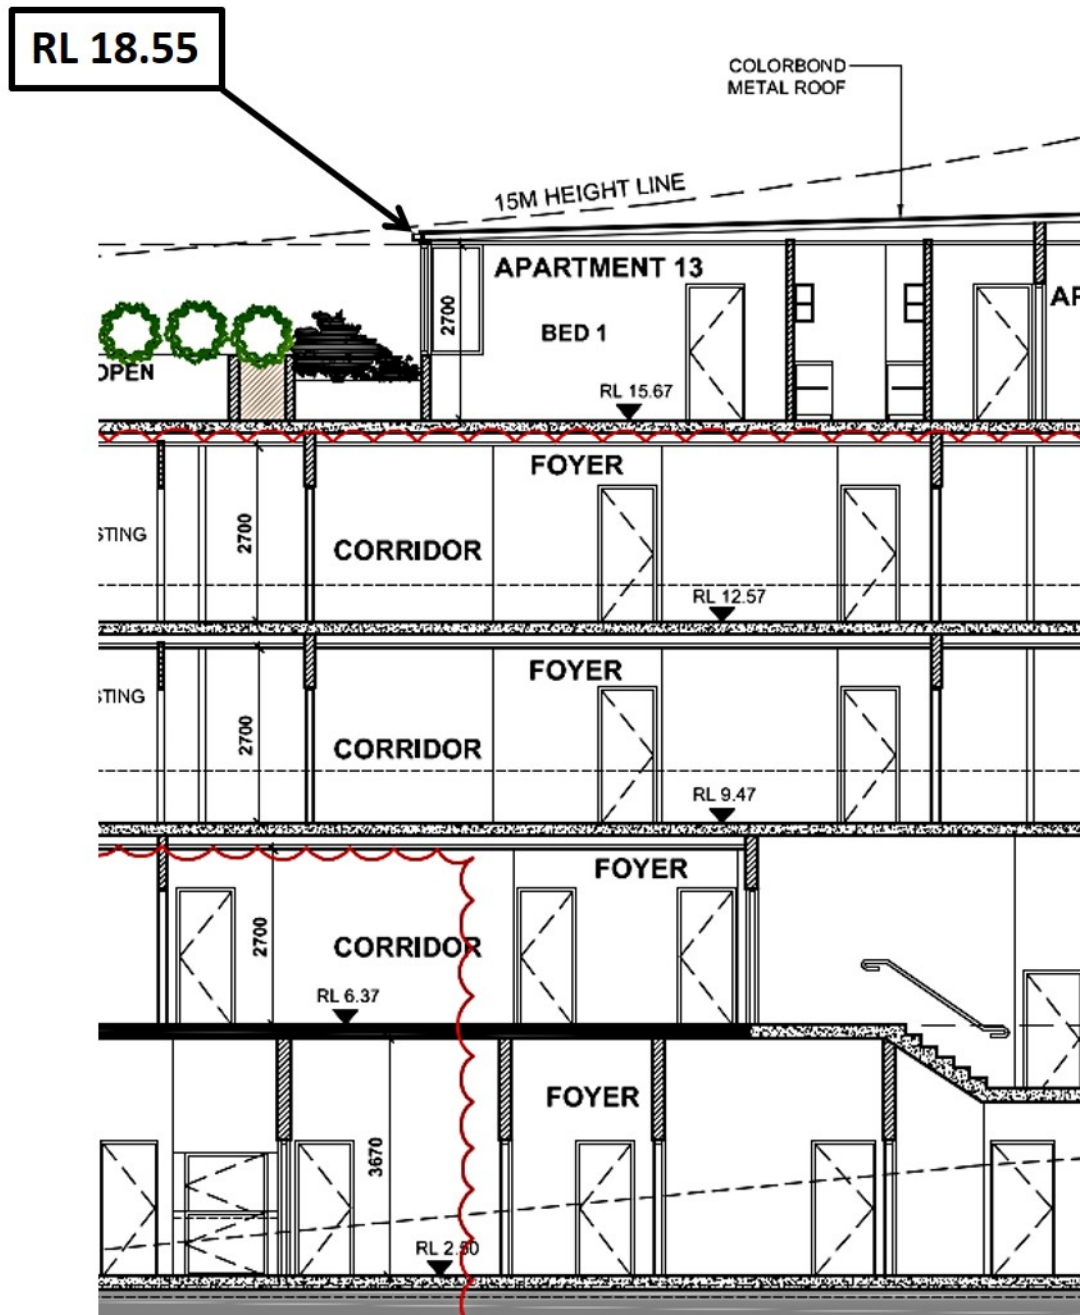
Section showing height of northernmost edge of roof above Apartment 13.
